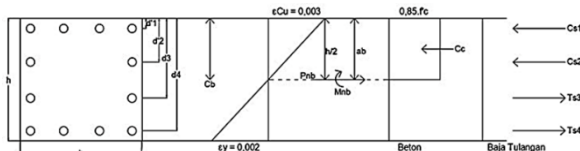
Strain Reinforcement Diagram of Column Cross-Sections
